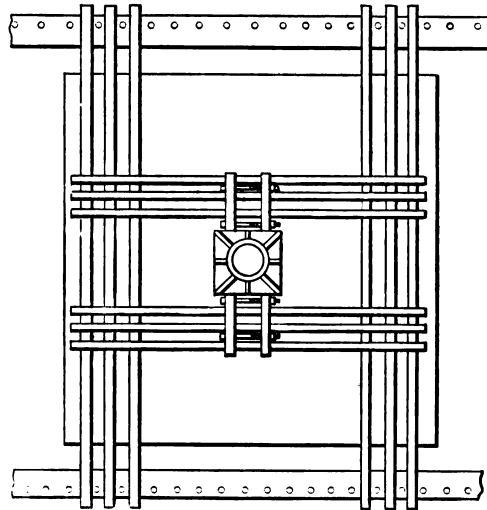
Plan View of Foundation with Clamps Shown Around the Column and Block Work Extending Out to the Supporting Screws.
